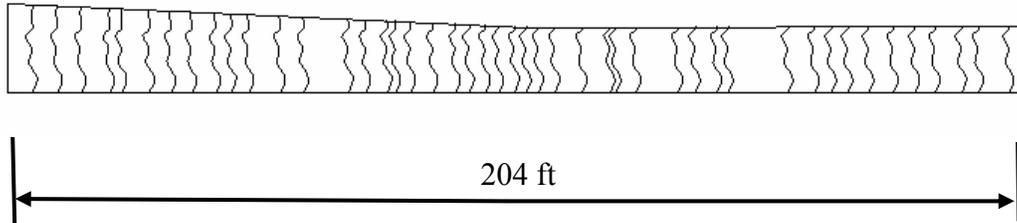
Layout of Cracks along Section 2—SF1-25
